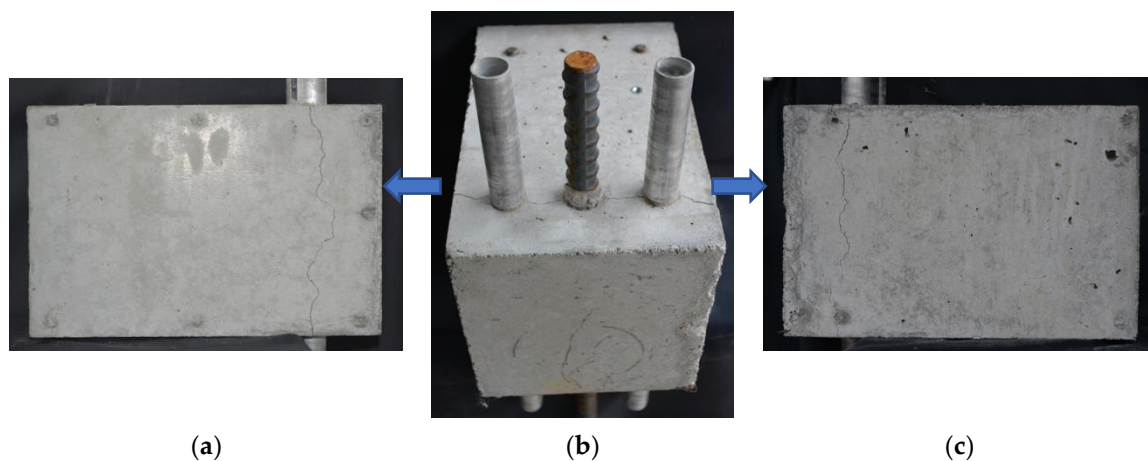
Specimen cracked by EAFP: (a) crack on specimen side; (b) crack on specimen top (considered crack with); (c) crack on other specimen sides.
